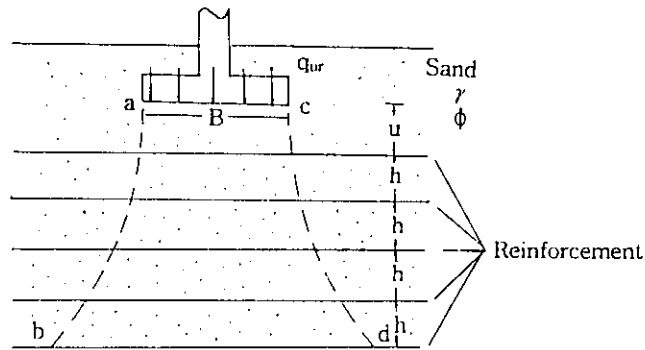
Schematic diagram of a strip foundation supported by sand reinforced by metal strips
